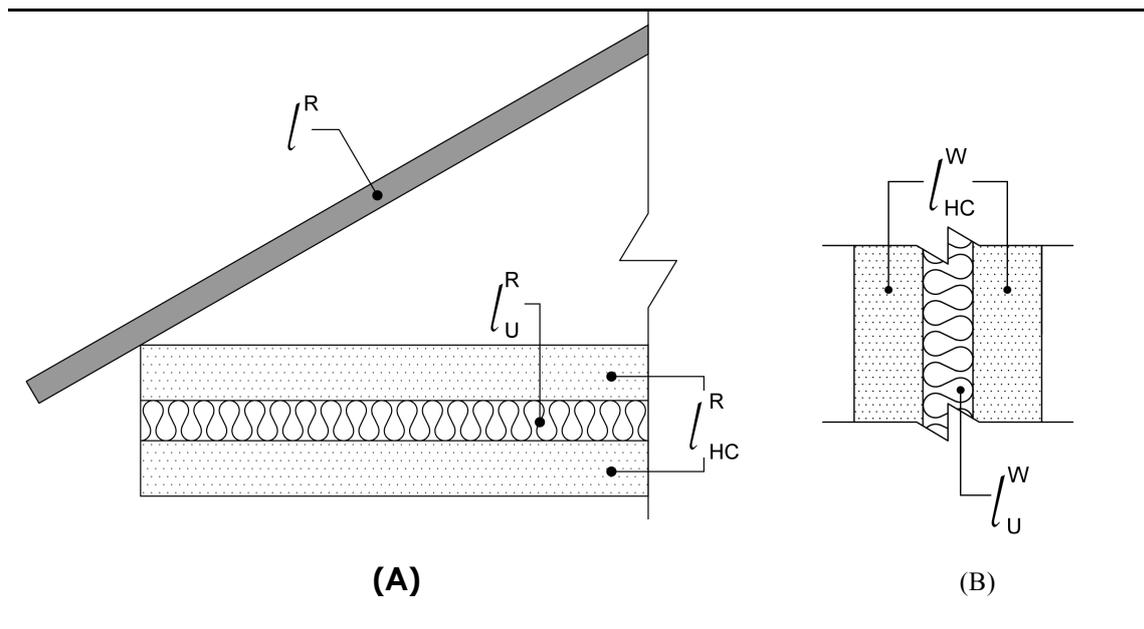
Roof (A) and wall (B) virtual construction scheme. Source: Favretto, 2015.
